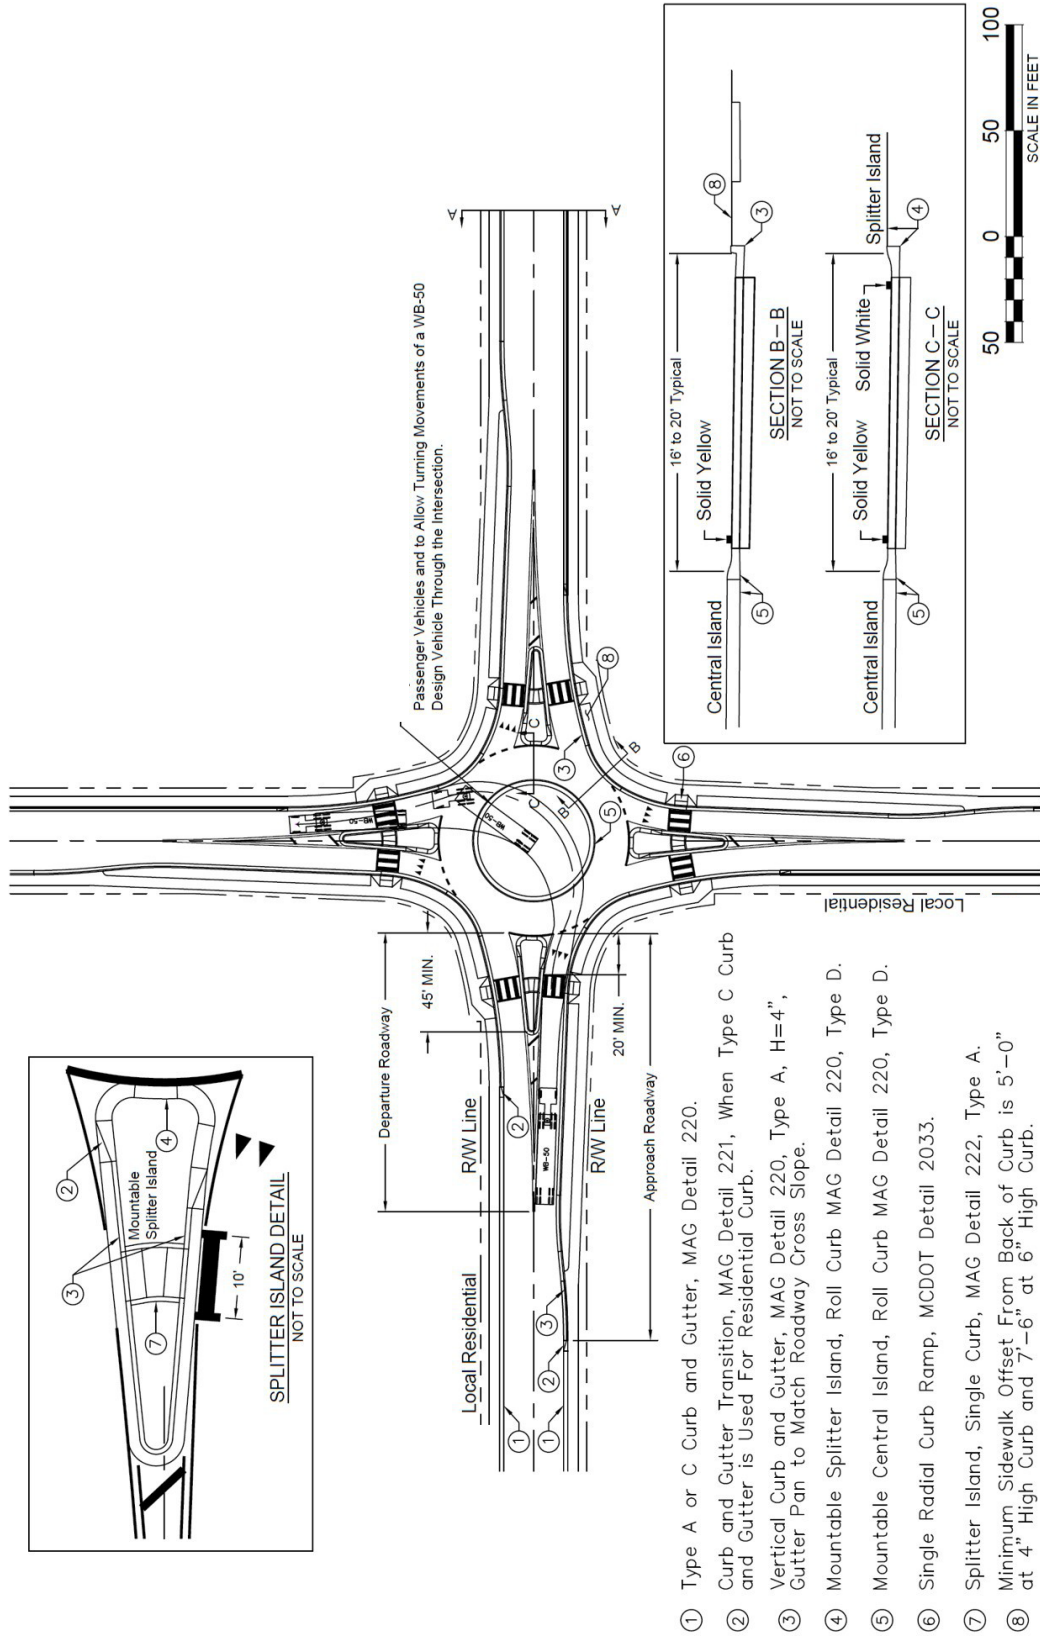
URBAN MINI-ROUNDBABOUT TYPICAL LAYOUT
